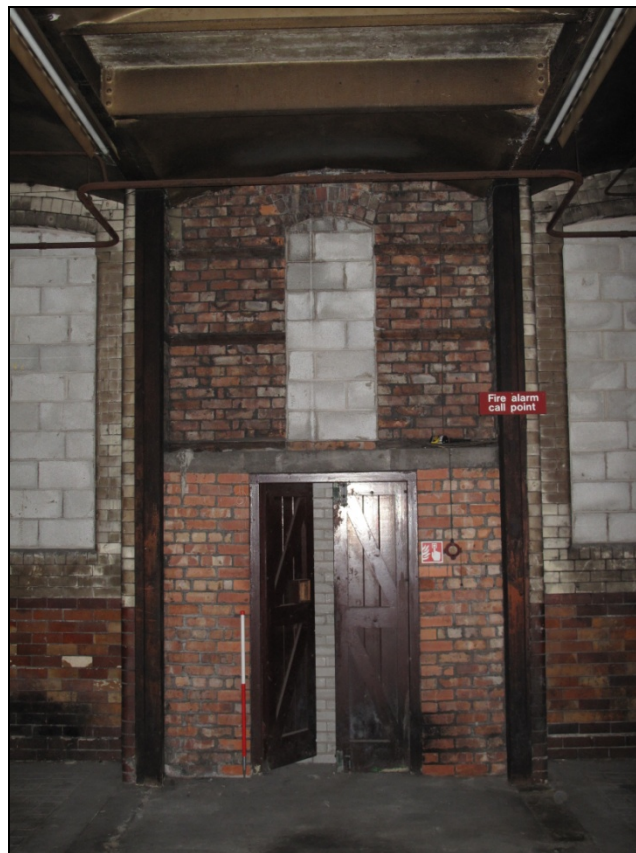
GF3f detail of the central entrance in the W. Elev., wall.
